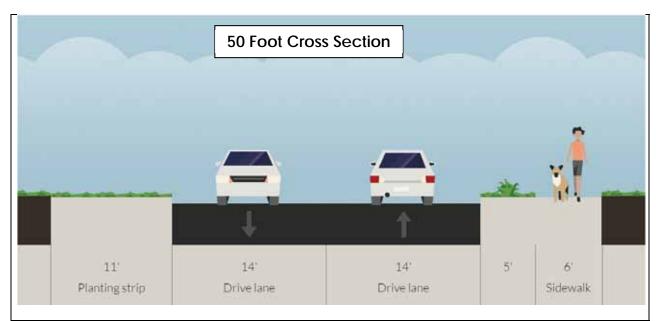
Proposed Configuration - Main Street Facing East - Town Hall to Central Street
